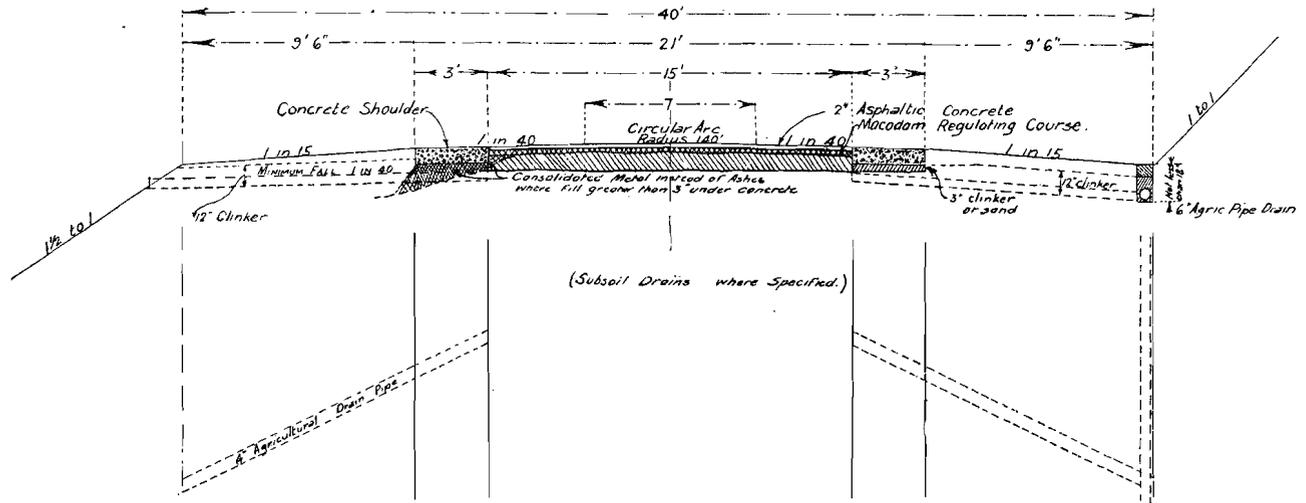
Normal Cross Section of Geelong Road as Widened
